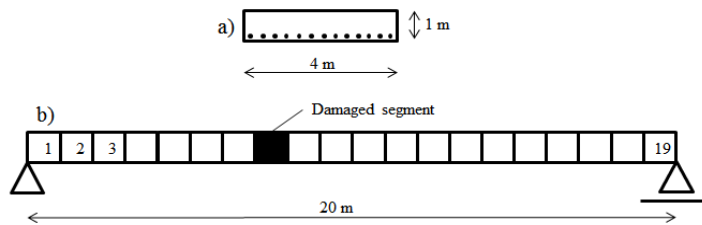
Example RC solid slab bridge’s a) cross-section and b) longitudinal view.
